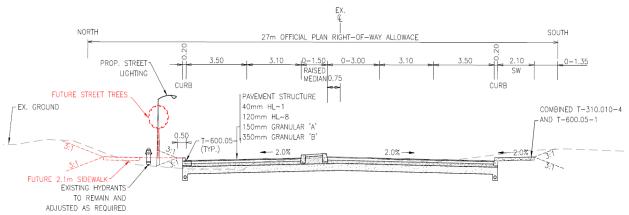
Passmore Avenue Typical Intersection Approach Section
